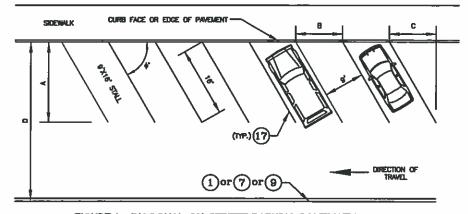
DIAGONAL ON-STREET PARKING SCHEMATIC
